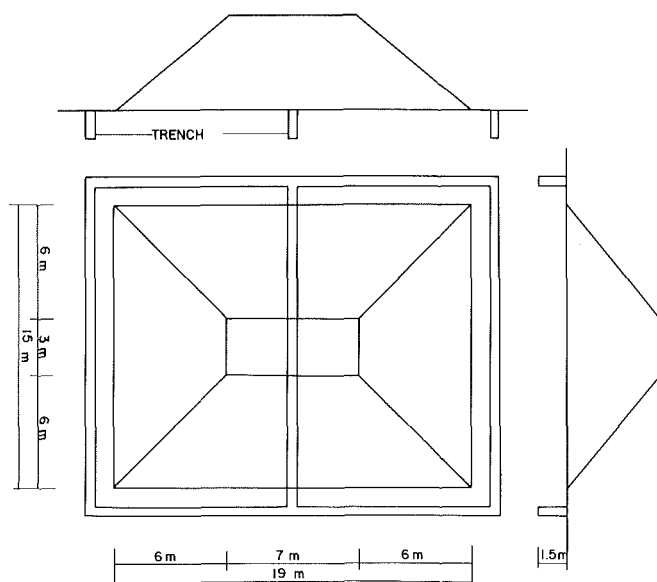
Plan and Sections of Test Embankment Showing Locations of Trenches
